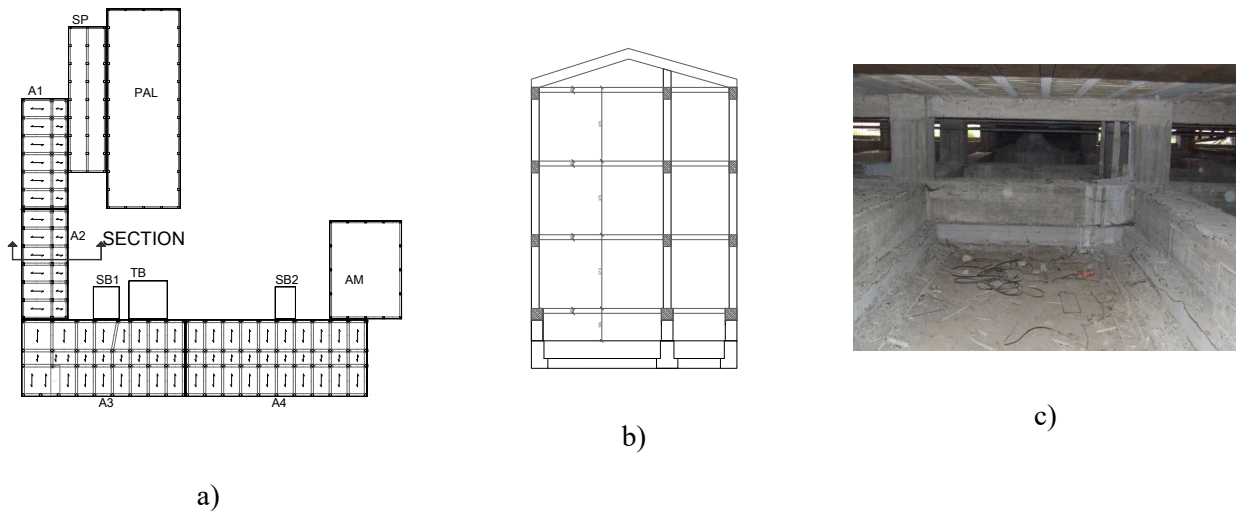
a) Plan of framing before retrofitting. b) Section of building A2. c) Foundation of buildings.
